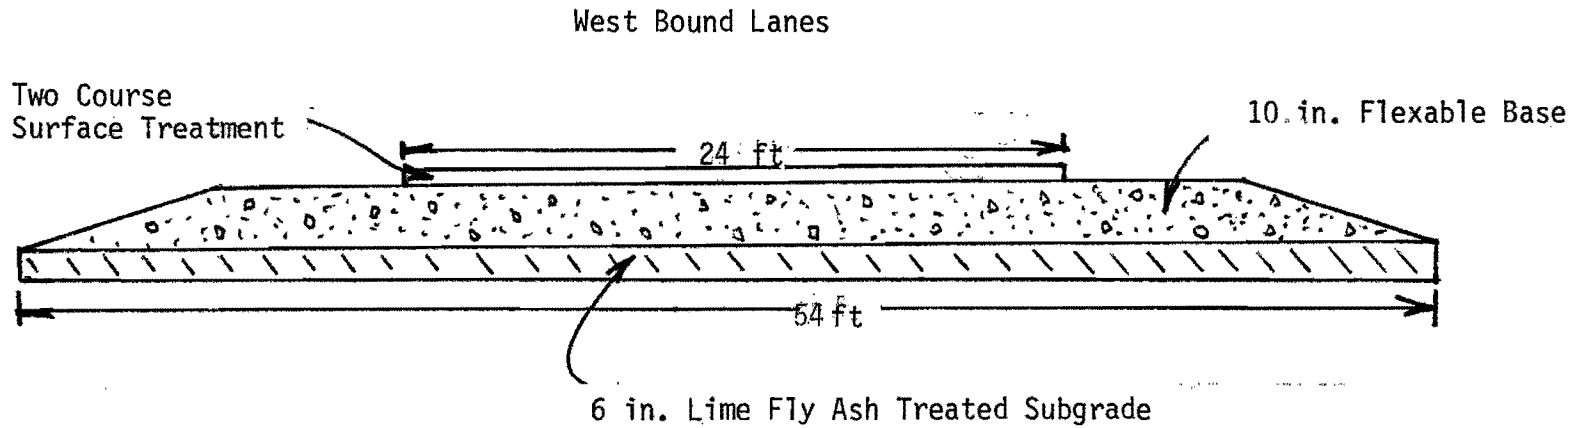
Typical Section of West Bound Lane on FM 1604 in Bexar County, Texas (Test Site No. 3)
